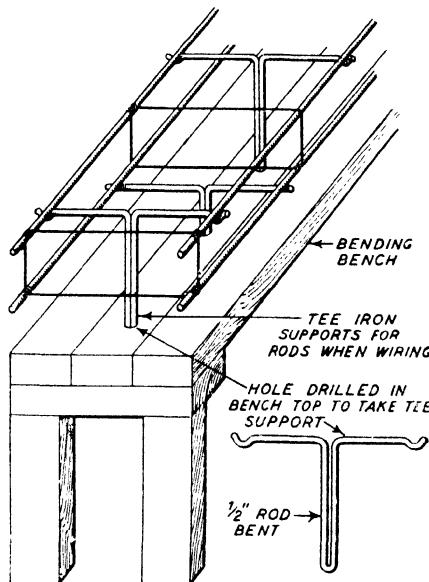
ASSEMBLING SECTION OF REINFORCEMENT ON BENCH
